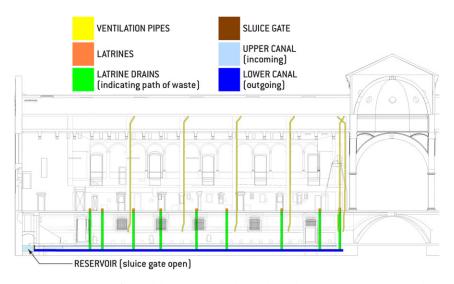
Elevation of Ospedale Maggiore, male ward, southwestern arm, interior. Author's reconstruction. See also architectureofthesoul.org.
